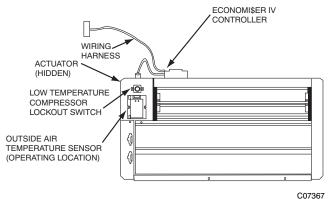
Economi\$er IV Component Locations — RGS/RAS036–180, RHS036–150, RGH/RAH036–150, RHH036–120 Units
